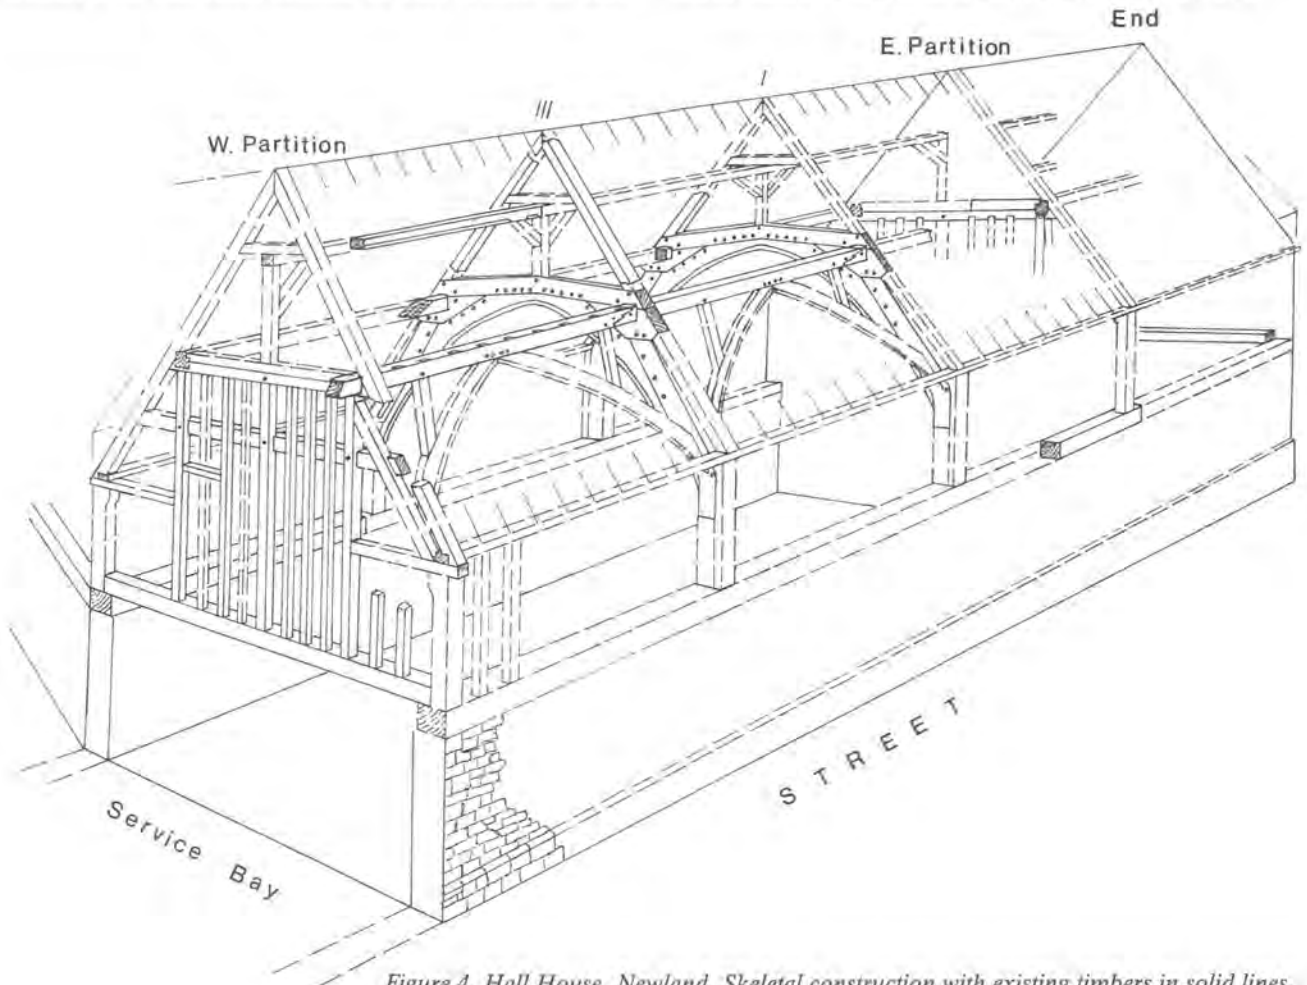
Hall House, Newland. Skeletal construction with existing timbers in solid lines.
